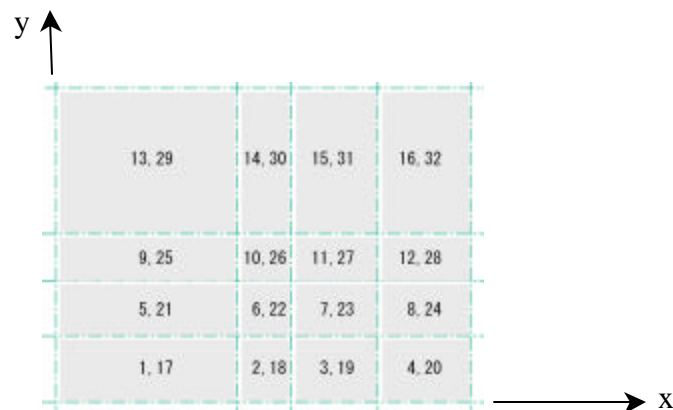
Locations, Orientation and Numbering of the finite elements representing the floor and ceiling diaphragms of the Small-House Index Building.
